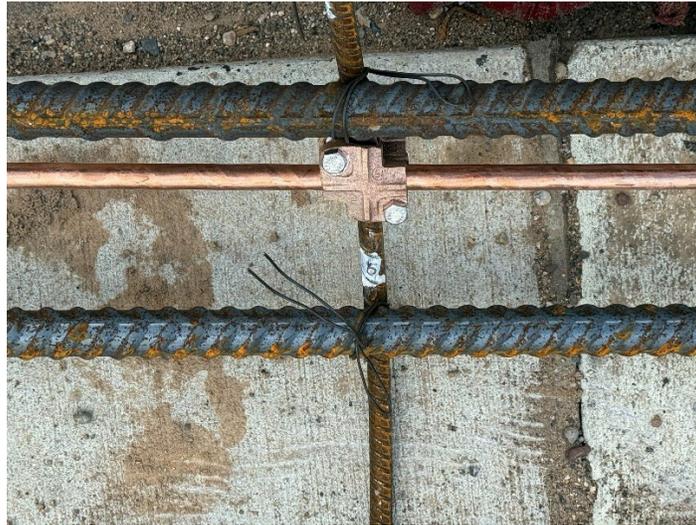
LP Systems for Drilled Shaft and Spread Footing Foundations
